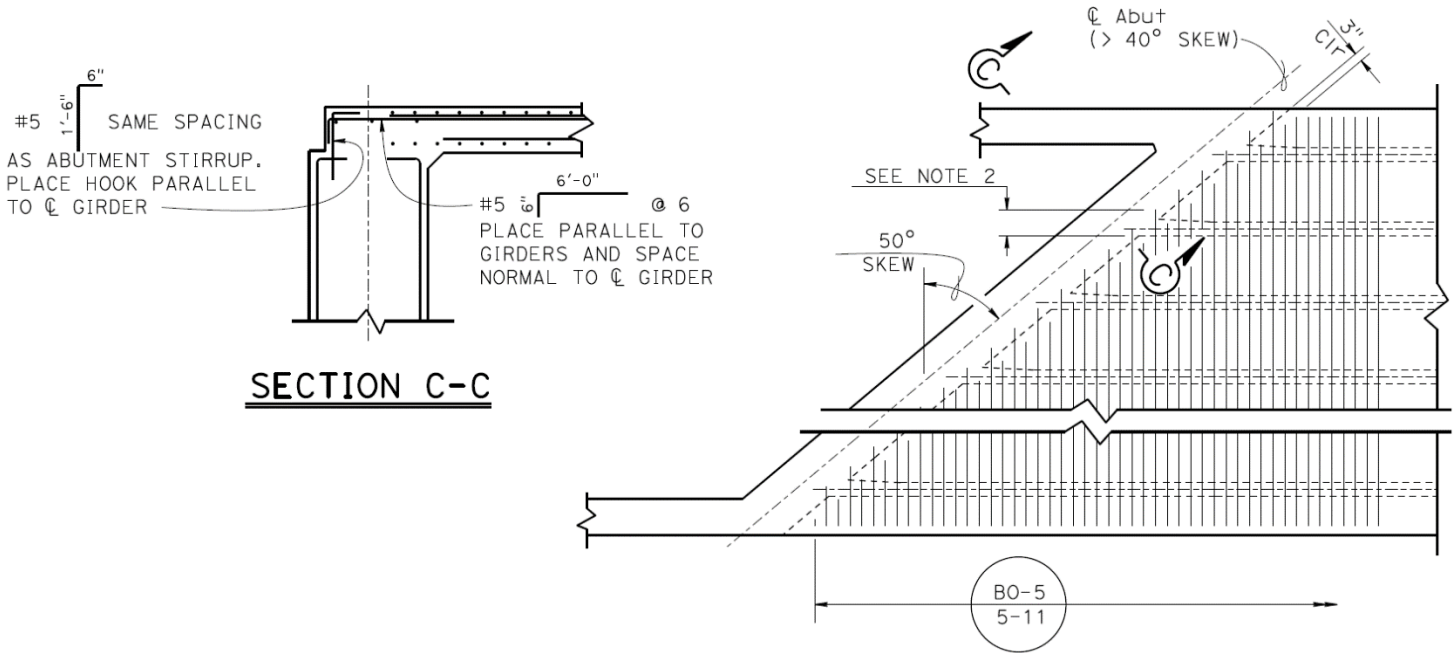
Transverse Deck Reinforcement Details at Abutment (> 40° Skew)
